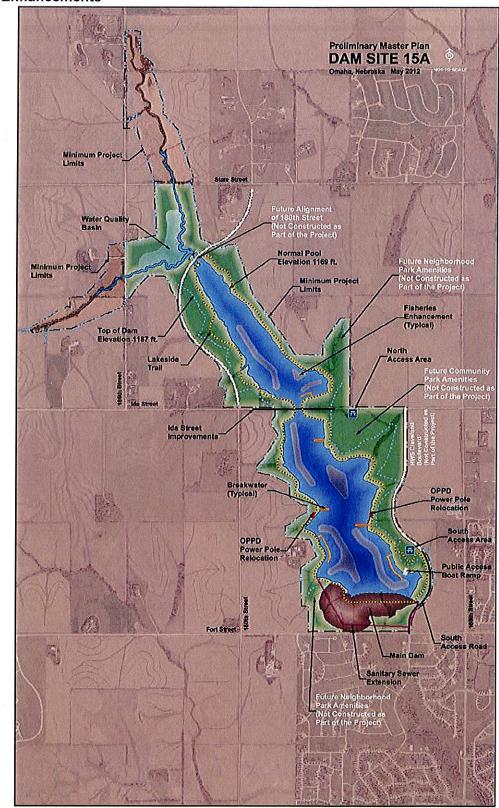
Dam Site 15A Preliminary Recreation Plan, Roadway Alignments and Fishery Enhancements
